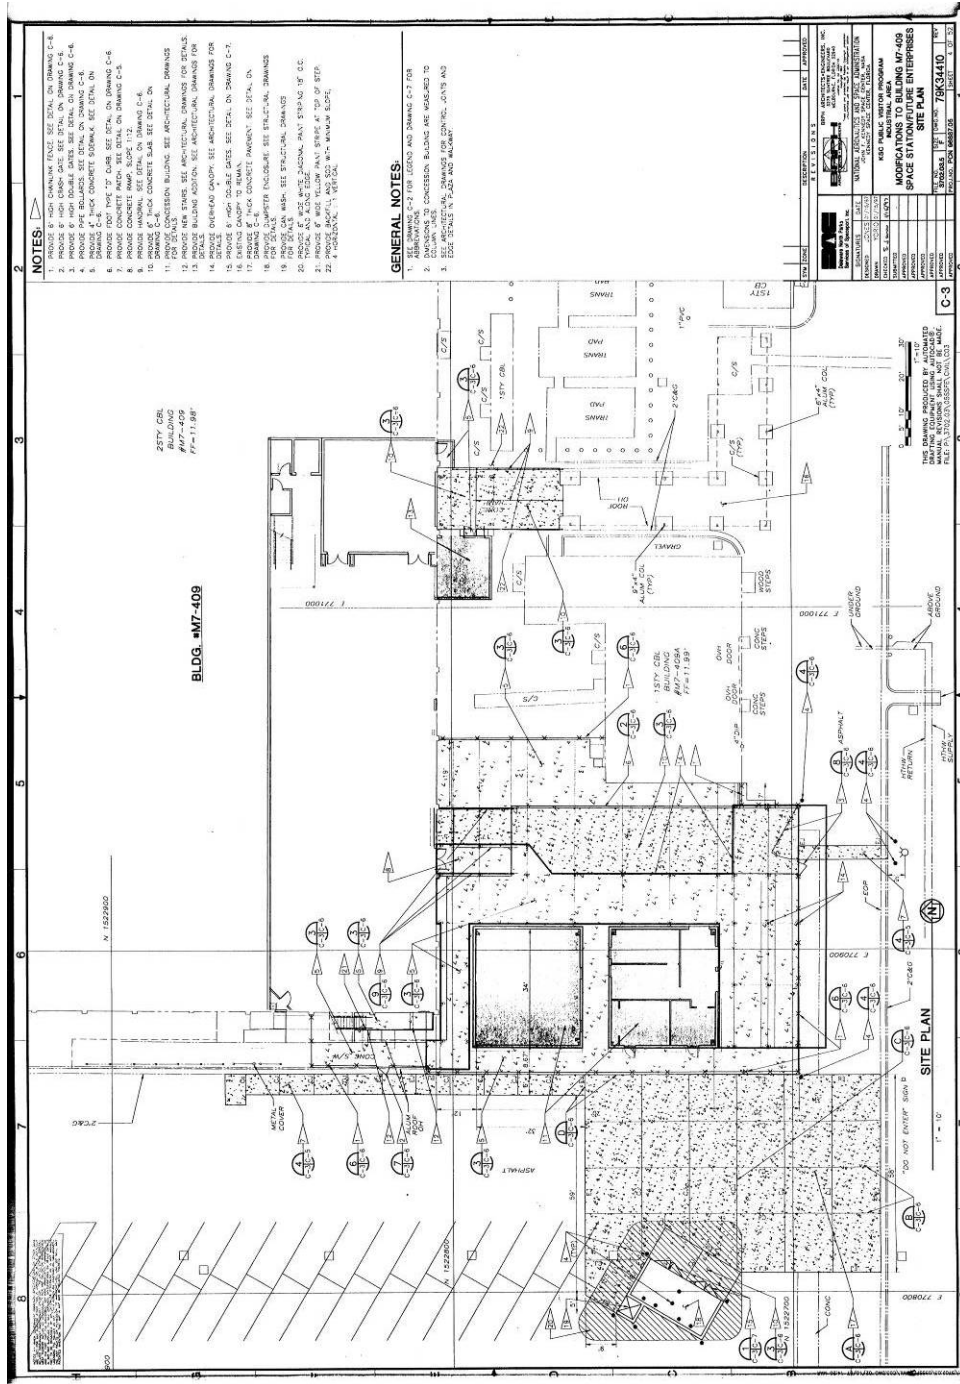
BRPH Architects & Engineers, Modifications to Building M7-409, Site Plan, January 1997, Sheet 4 of 52.
